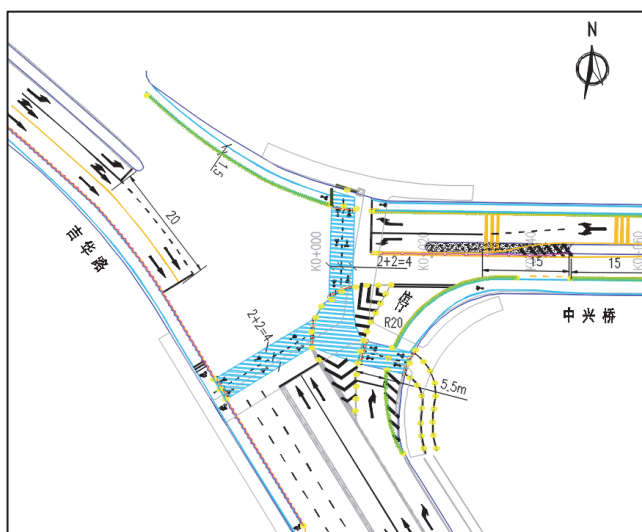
Design Plan for Non-Motorized Vehicle Crosswalk Facilities at Intersections
